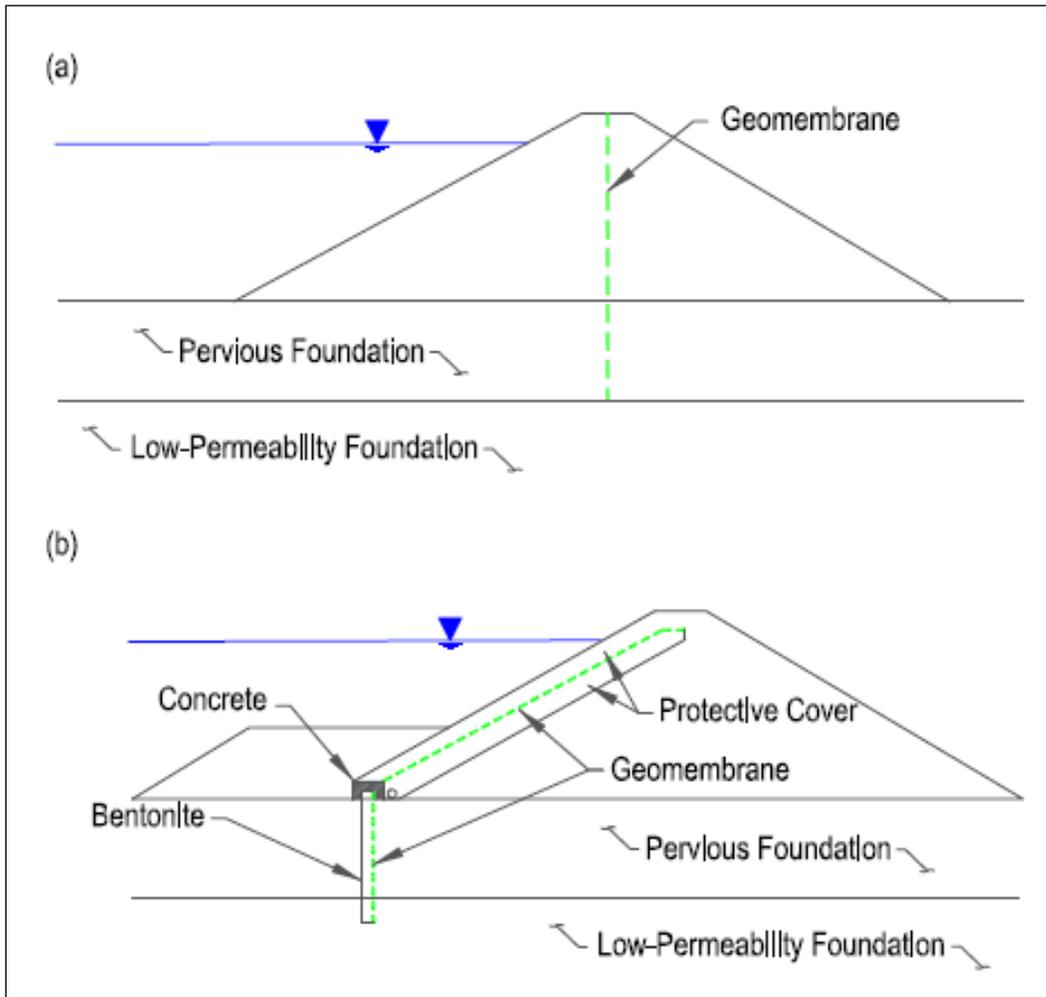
General geomembrane cutoff wall configurations.
